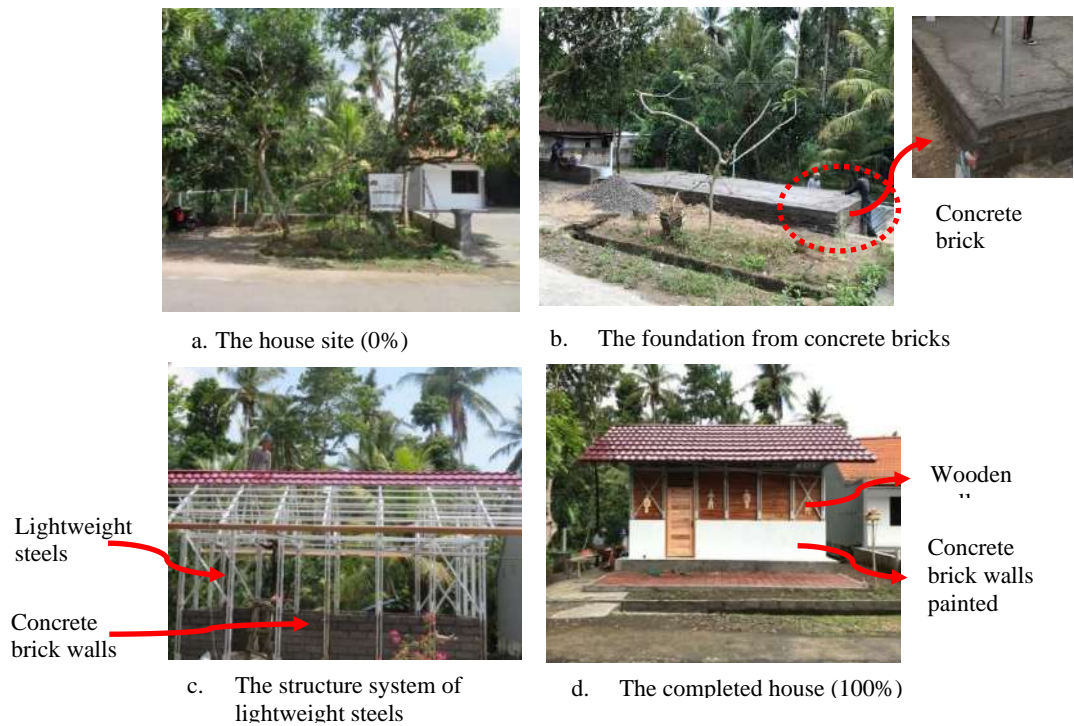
The construction stages of the instant simple house with the structural system of lightweight steels, bracing and local wooden walls
